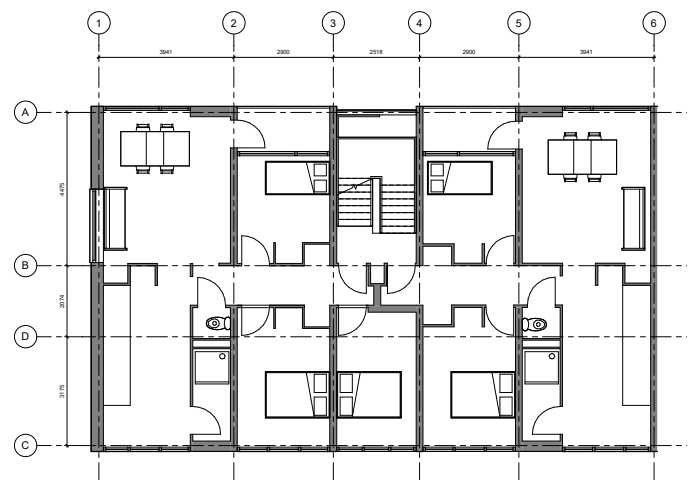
Bouwen Erwoutsstraat typical floor plan of block unit .
